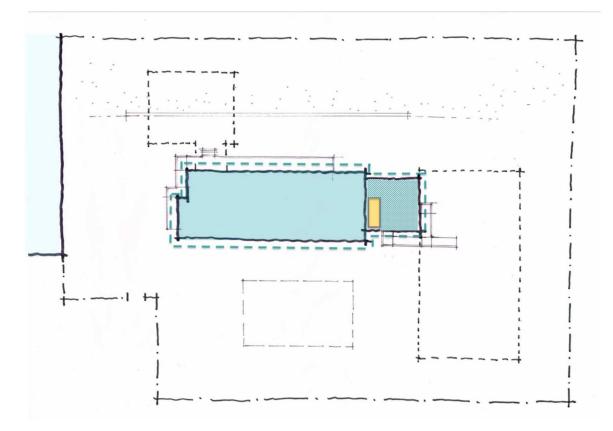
Building Type 3 – Urban School Building Site Plan
